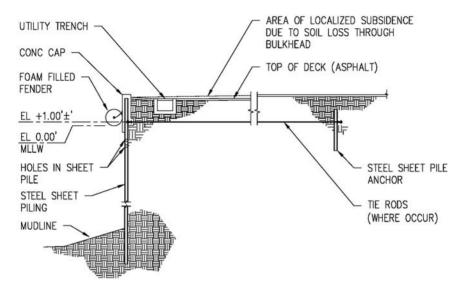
Section of a typical bulkhead arrangement showing soil loss and pavement subsidence through a sheet pile bulkhead Source: Courtesy of Moffatt & Nichol, Inc., reproduced with permission.
